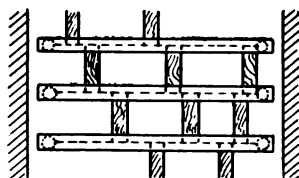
Showing application of Distance Pieces to keep Steel Girders in Position.
